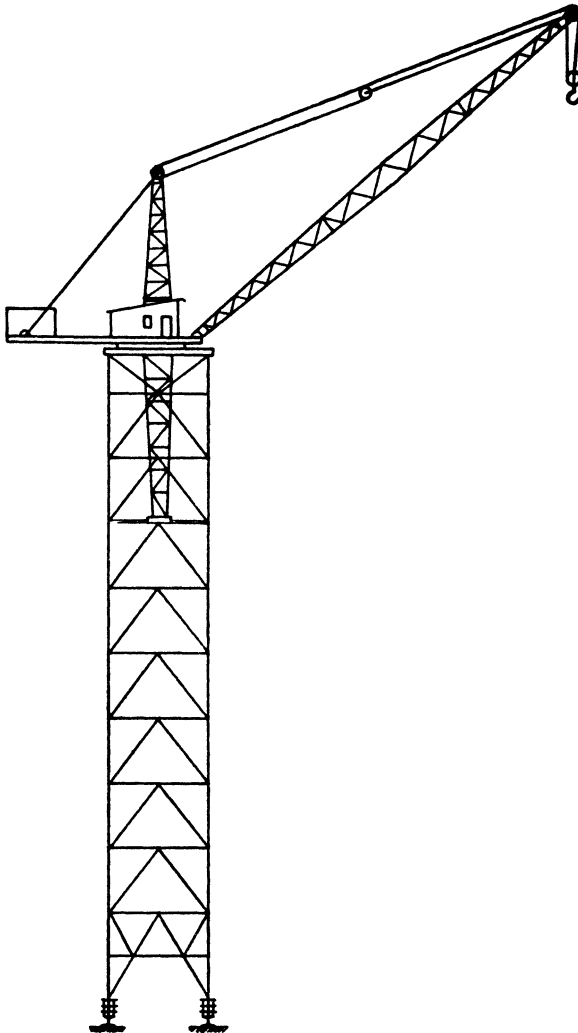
TOWER CRANE (OR TOWER DERRICK CRANE)
